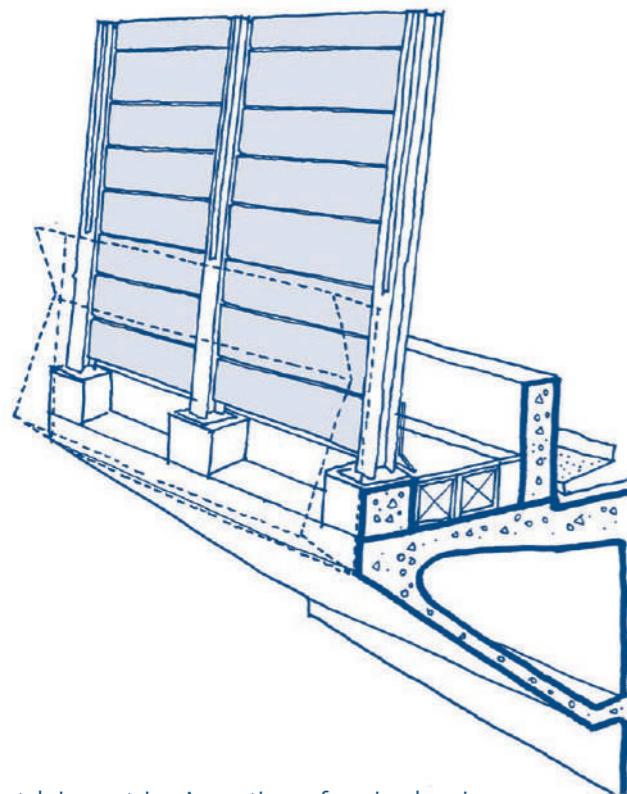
\_ Sketch isometric - Acoustic performing barrier
